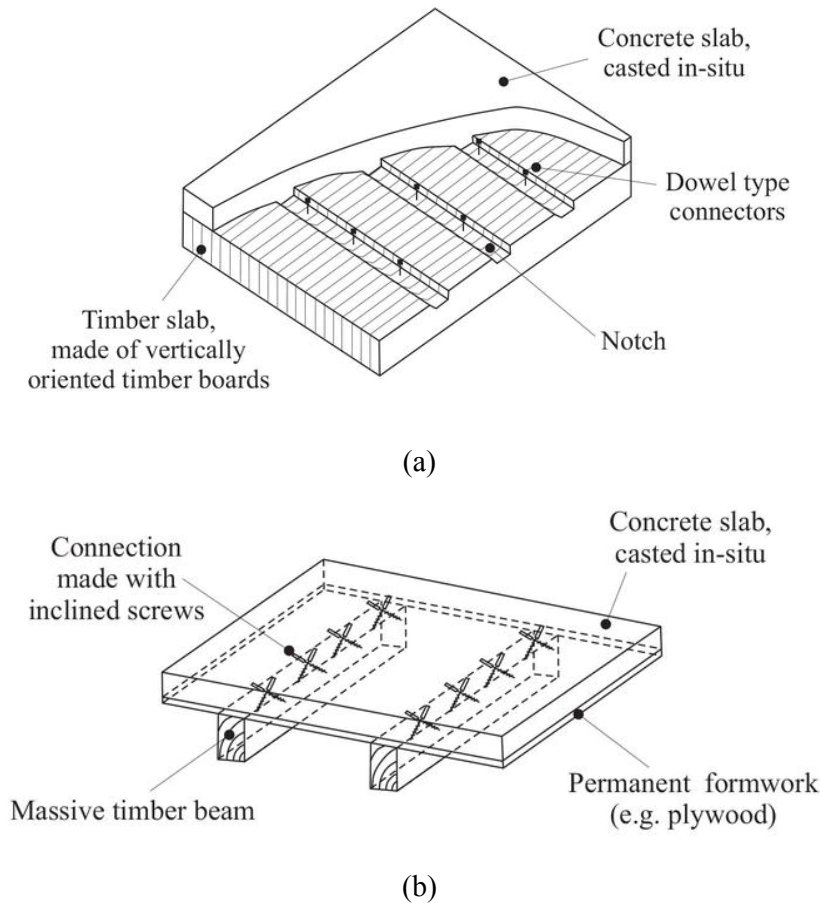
Examples of slab and beam types of TCC floor systems. (a) An example of slab type of TCC floors. (b) An example of beam type of TCC floors.
